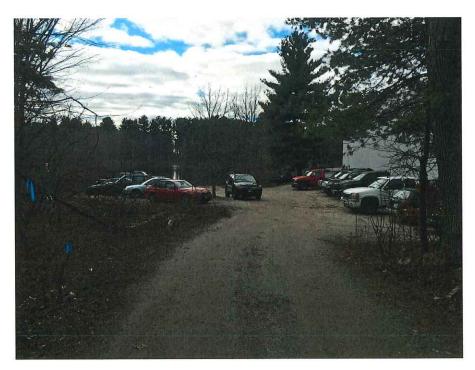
Looking south west at existing gravel parking area south of existing warehouse building.
